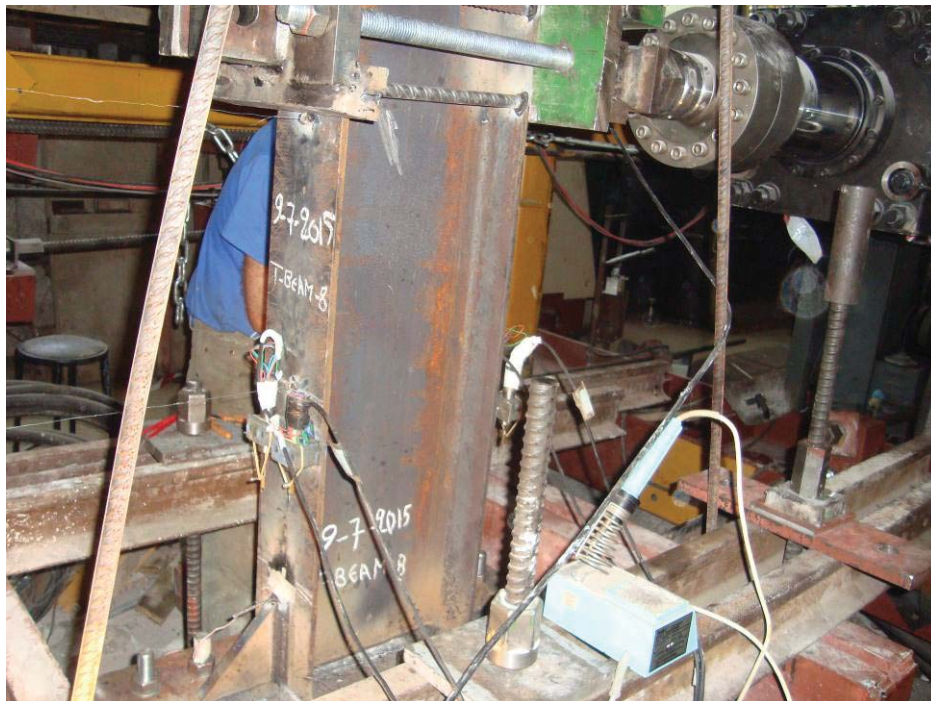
Details of the experimental setup with the tested IPE 300 T-Beam 8 beam-to-column joint specimen
